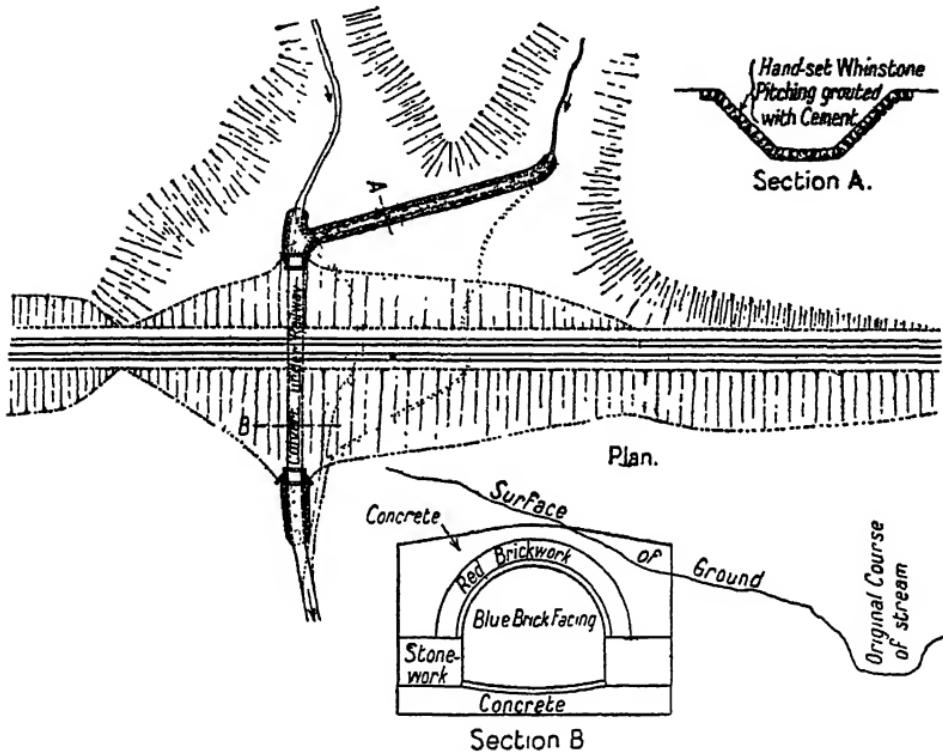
Two water-courses conveyed in one culvert under railway.
